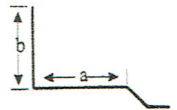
Sidewall flashing is applied when the side of the roof butts up against an adjacent wall. The wall-side of the flashing can either be covered over with siding or sealed with caulk (order SW-1C). Butyl tape should be applied where the "foot" of the flashing attaches to the roof.
